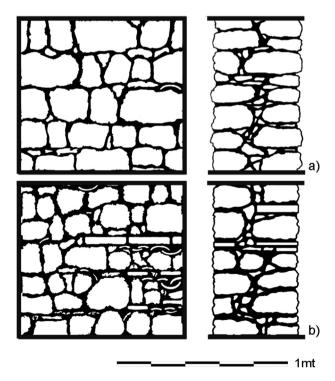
Façade and cross-section of masonry types: a) Mu1; b) Mu4.
